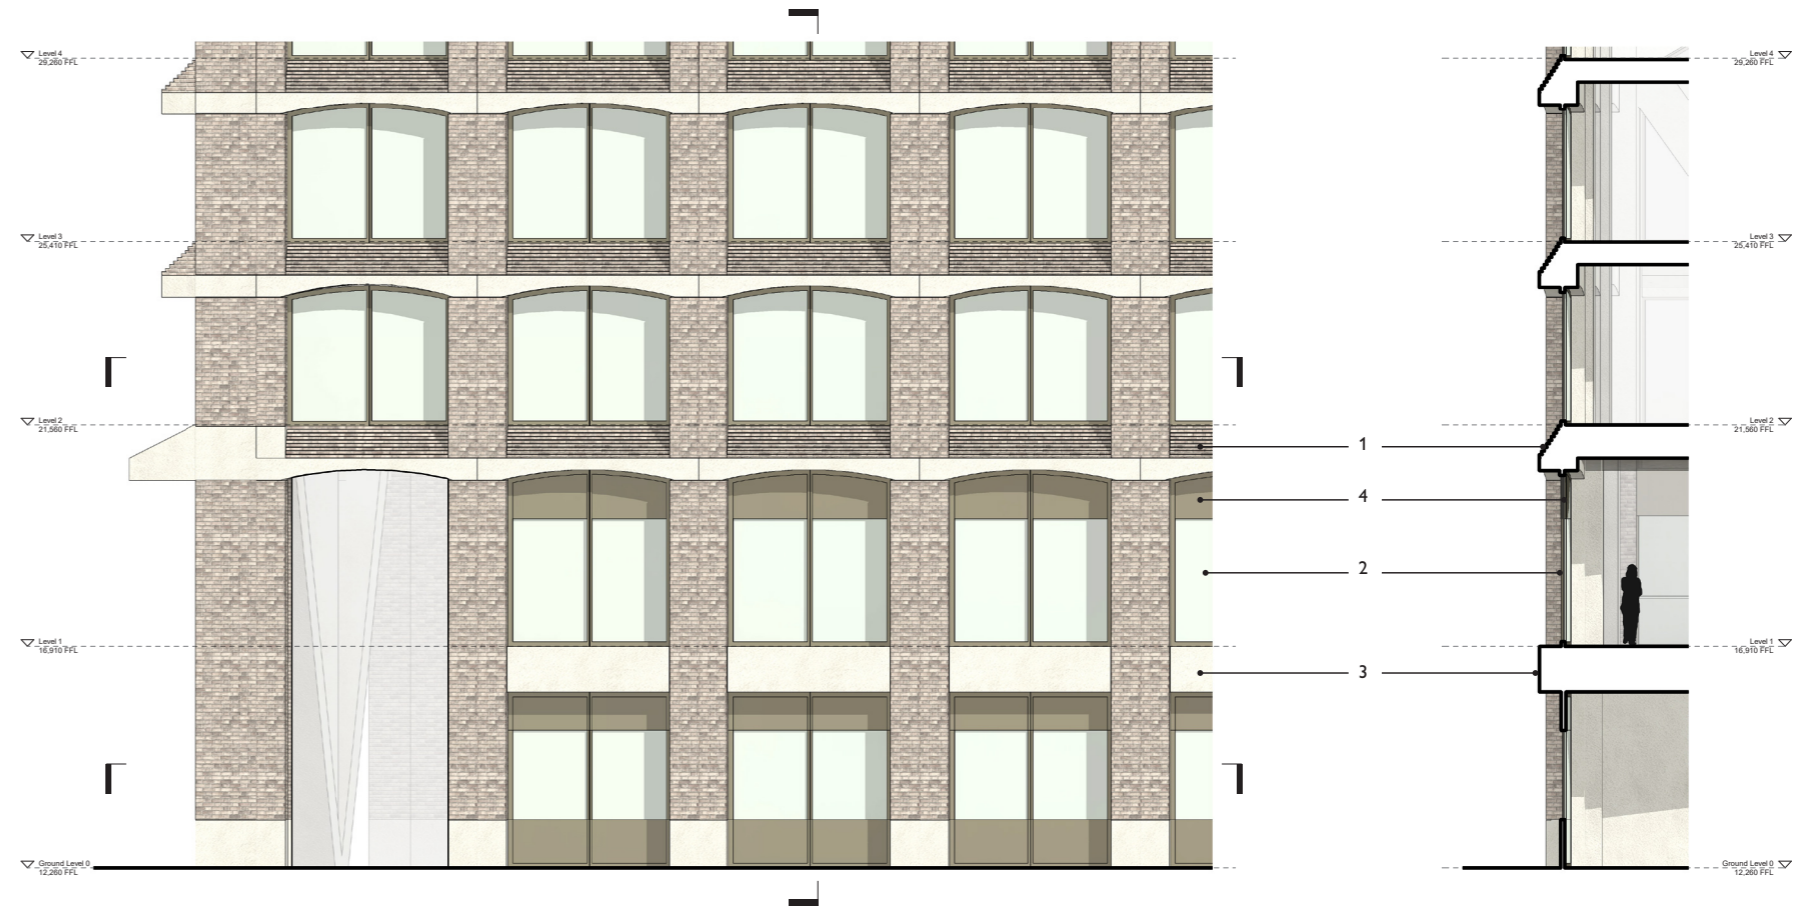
West Façade - typical plan, section & elevation - bottom & middle
